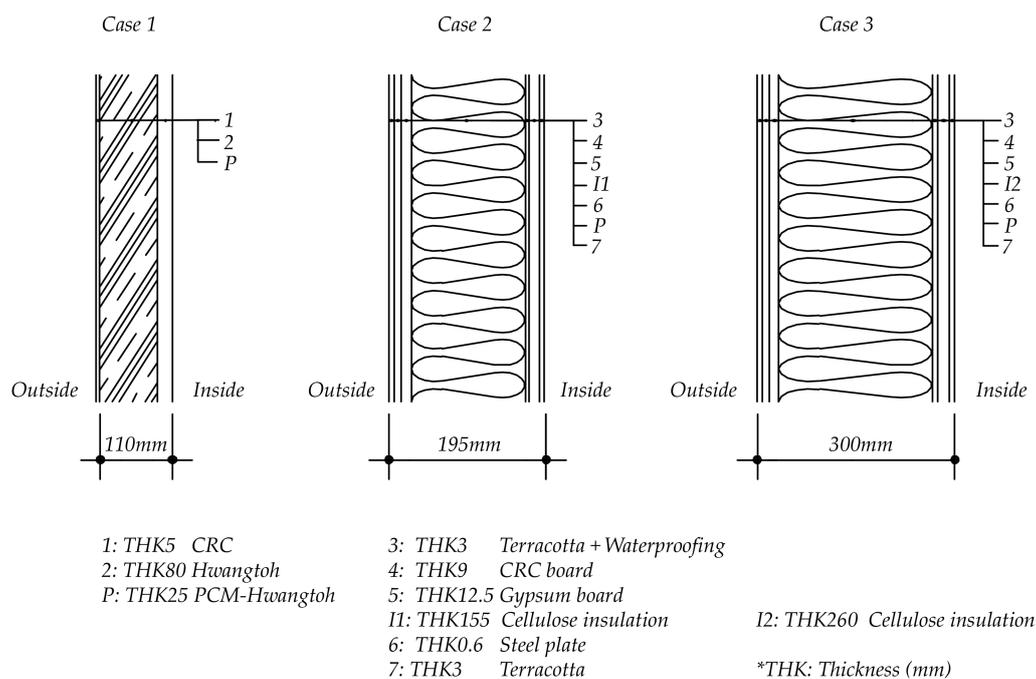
Section drawing detail of PCM-*Hwangtoh* composites installation.
